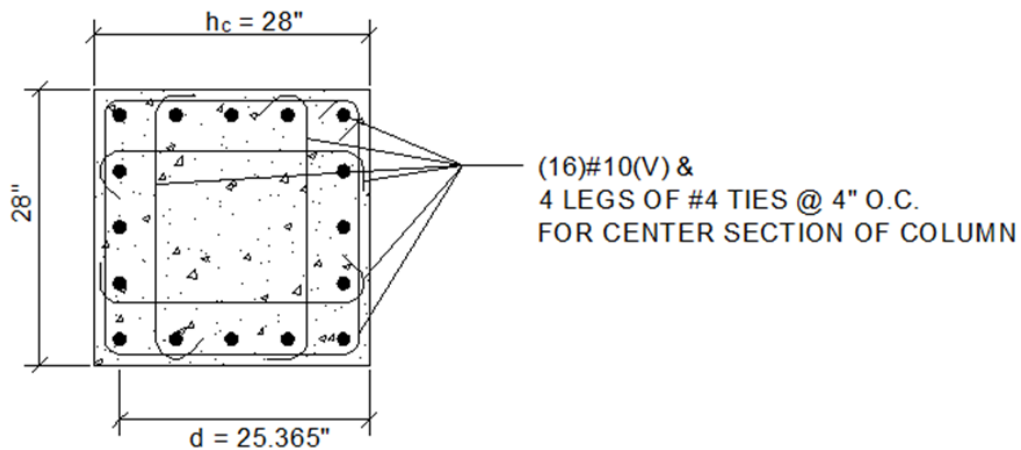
Exterior column, cross-section at center of column at ground floor level based on tsunami design requirements.
